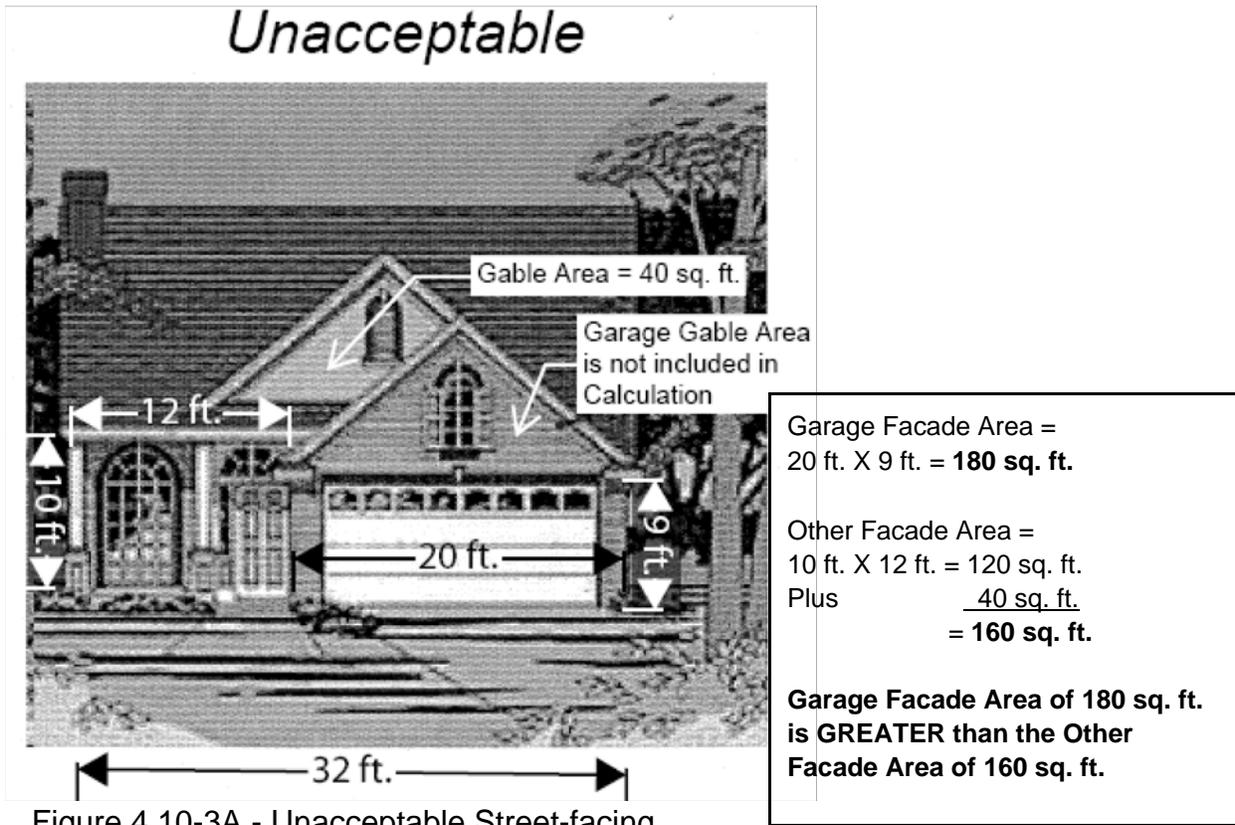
A - Unacceptable Street-facing Garage Facade Area
